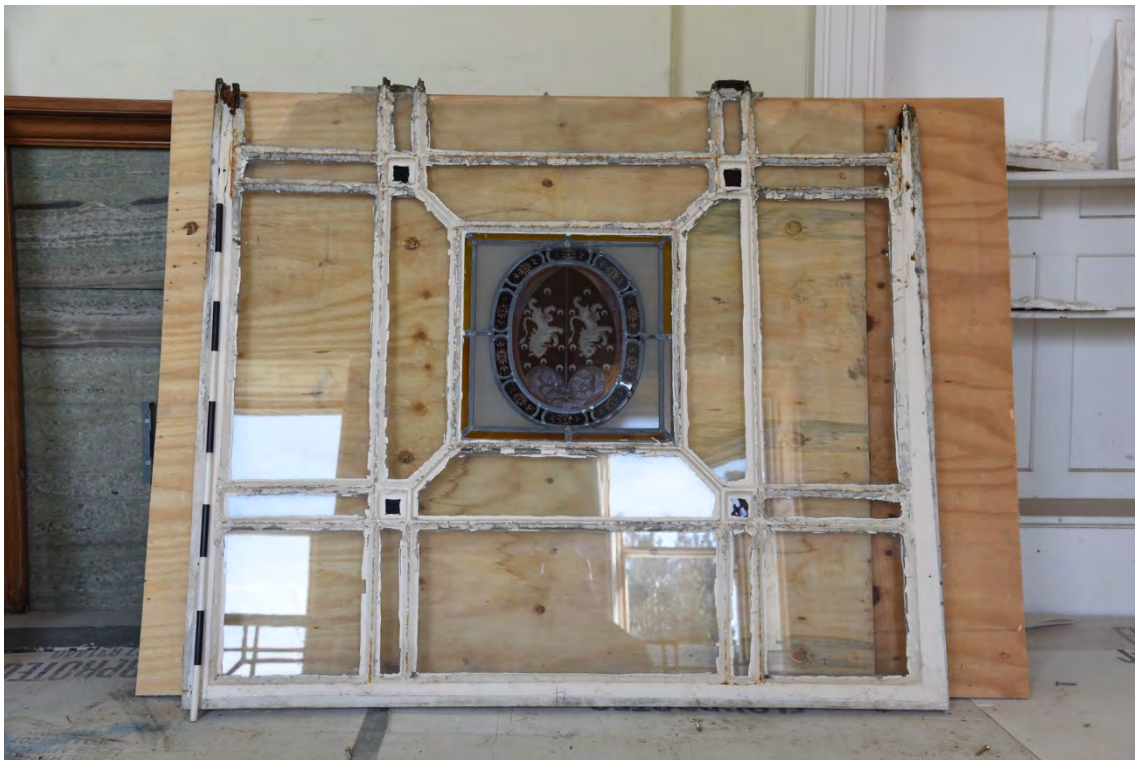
Window panel removed from the lantern's NW elevation, exterior view (BRH198)
